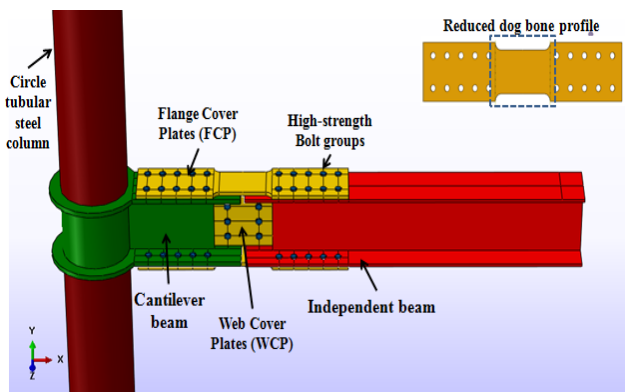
Prefabricated Steel Beam Column Joint with Bolted flange and web connectors
